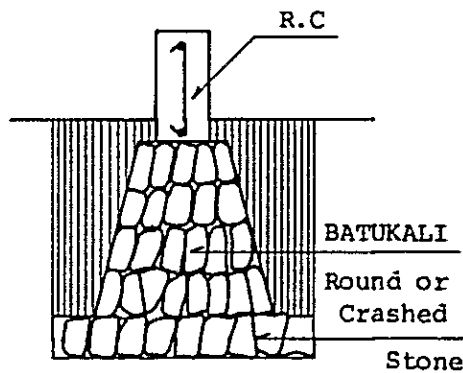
PROPOSED FOUNDATION SYSTEM
